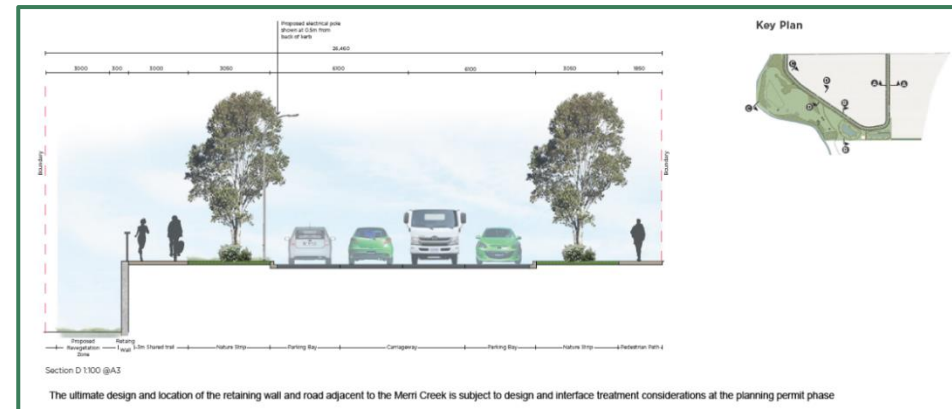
ROAD CROSS SECTION ADJACENT THE MERRI CREEK CORRIDOR
